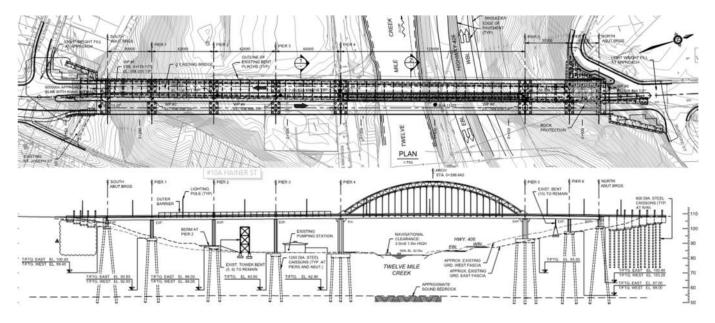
Burgoyne Bridge Plan and Elevation
